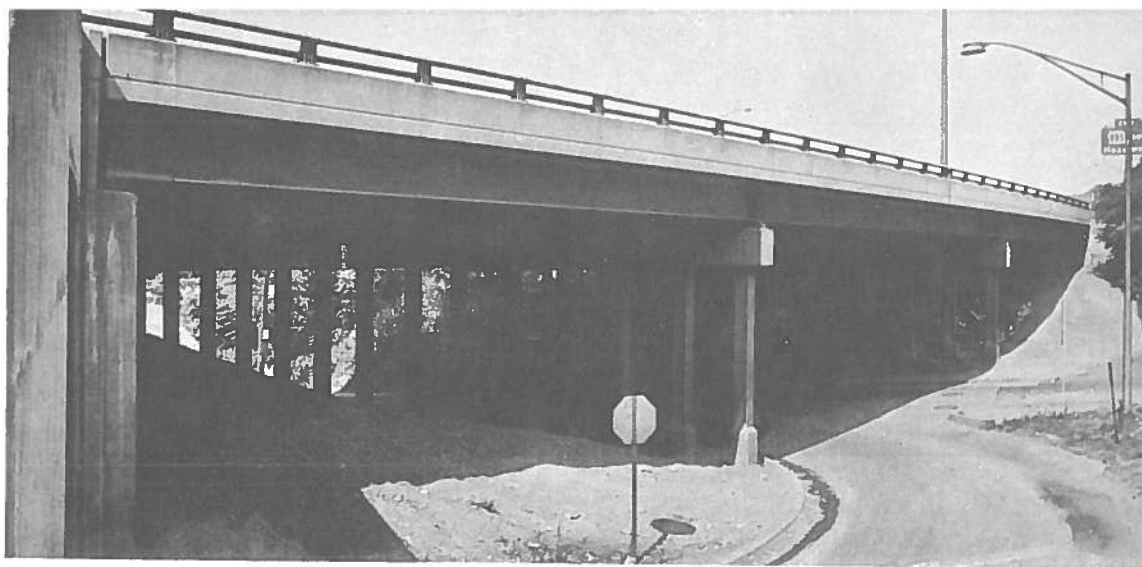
CONTINUOUS WIDE FLANGE BEAM BRIDGE, PENNSYLVANIA
